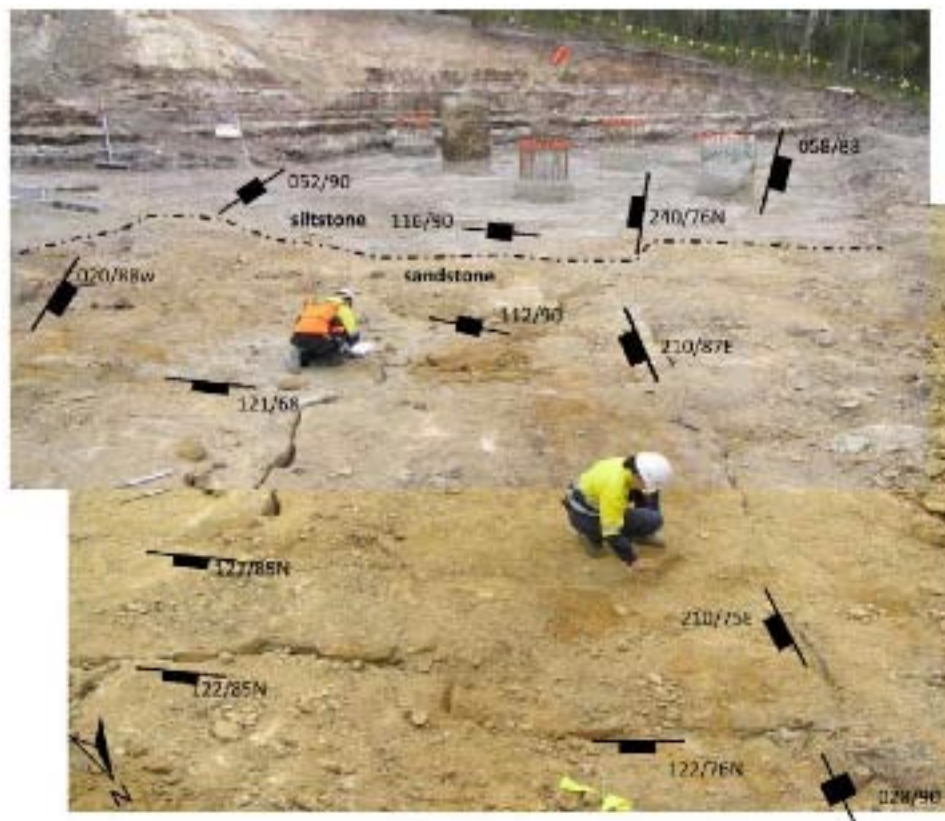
Viaduct 3 Abutment A excavation for abutment foundation
